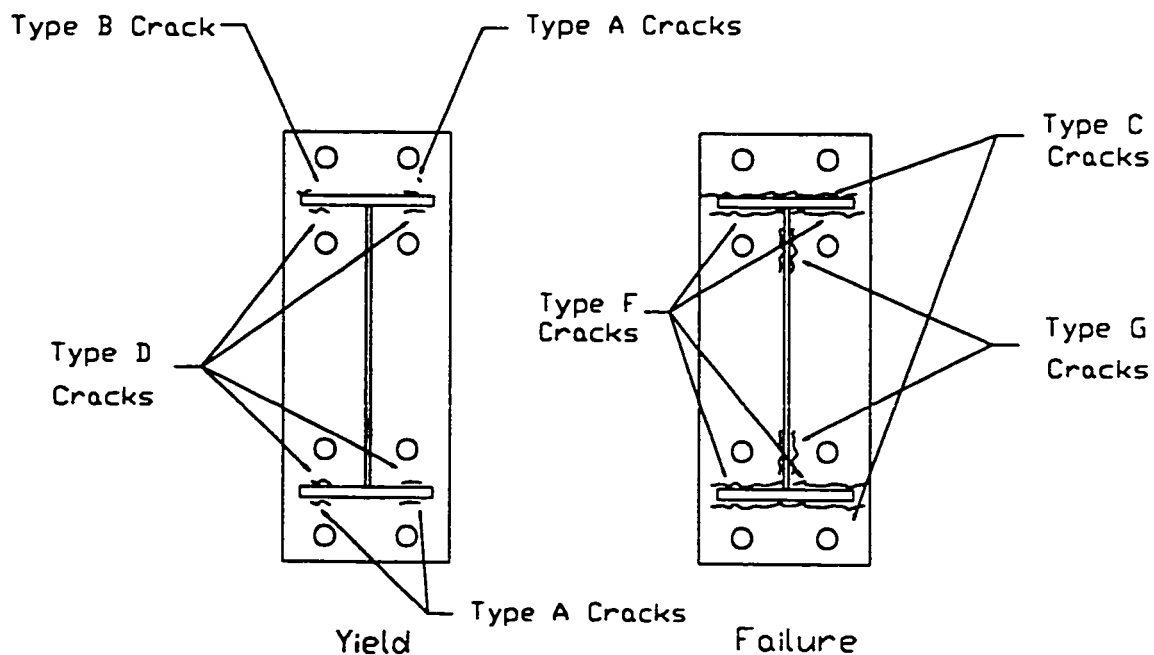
Crack Locations at Yield and Failure for Connection M-1
